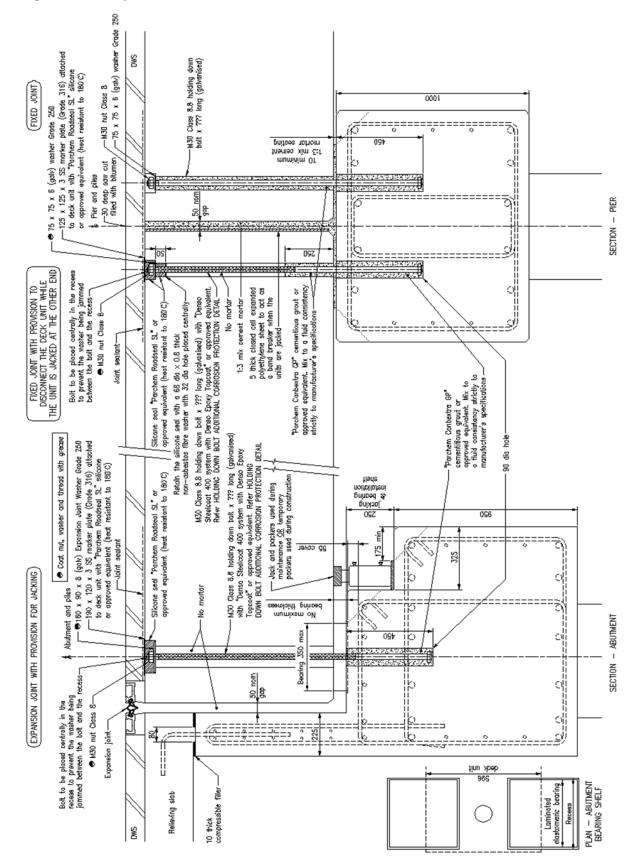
Expansion Abutment Joint and Fixed Pier Joints – DWS on Deck Units ≤20 m
